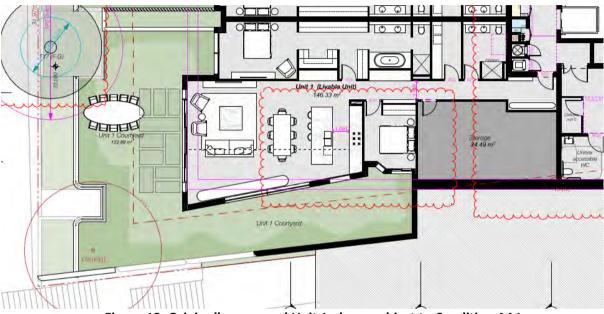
Originally proposed Unit 1 plan – subject to Condition AA1
